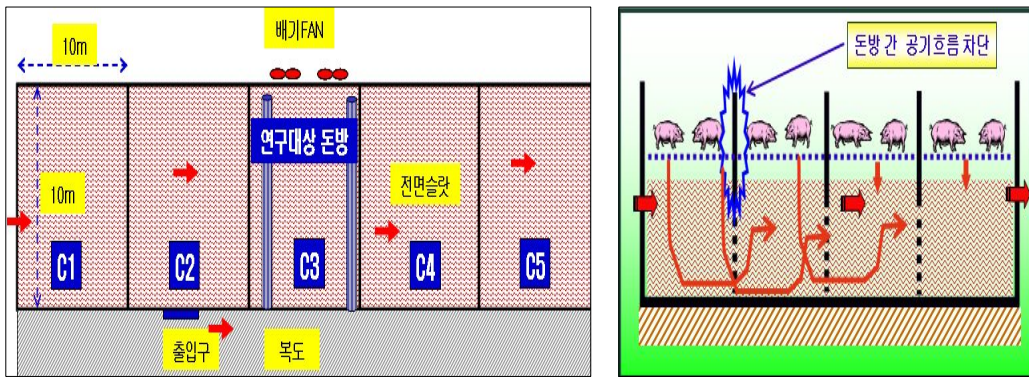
Structure of slurry pit and ground of C pig house.
